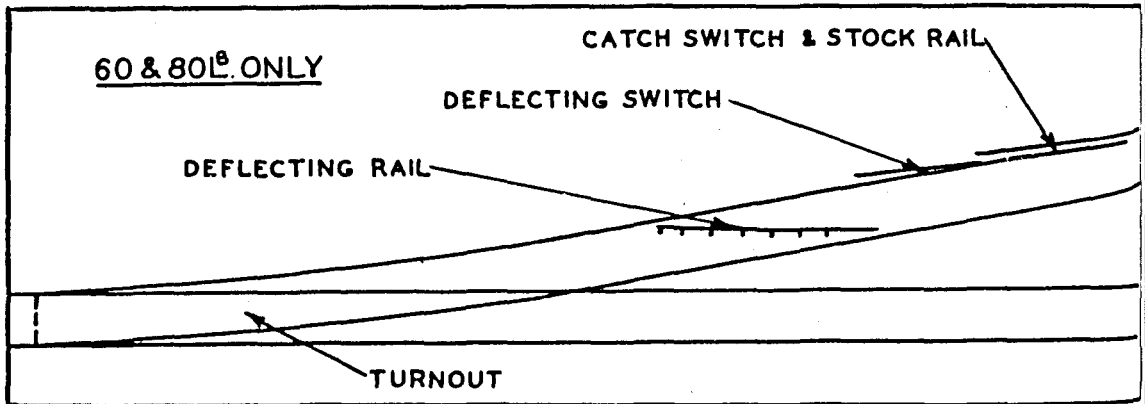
ARRANGEMENT OF DEFLECTING RAIL & SWITCH
